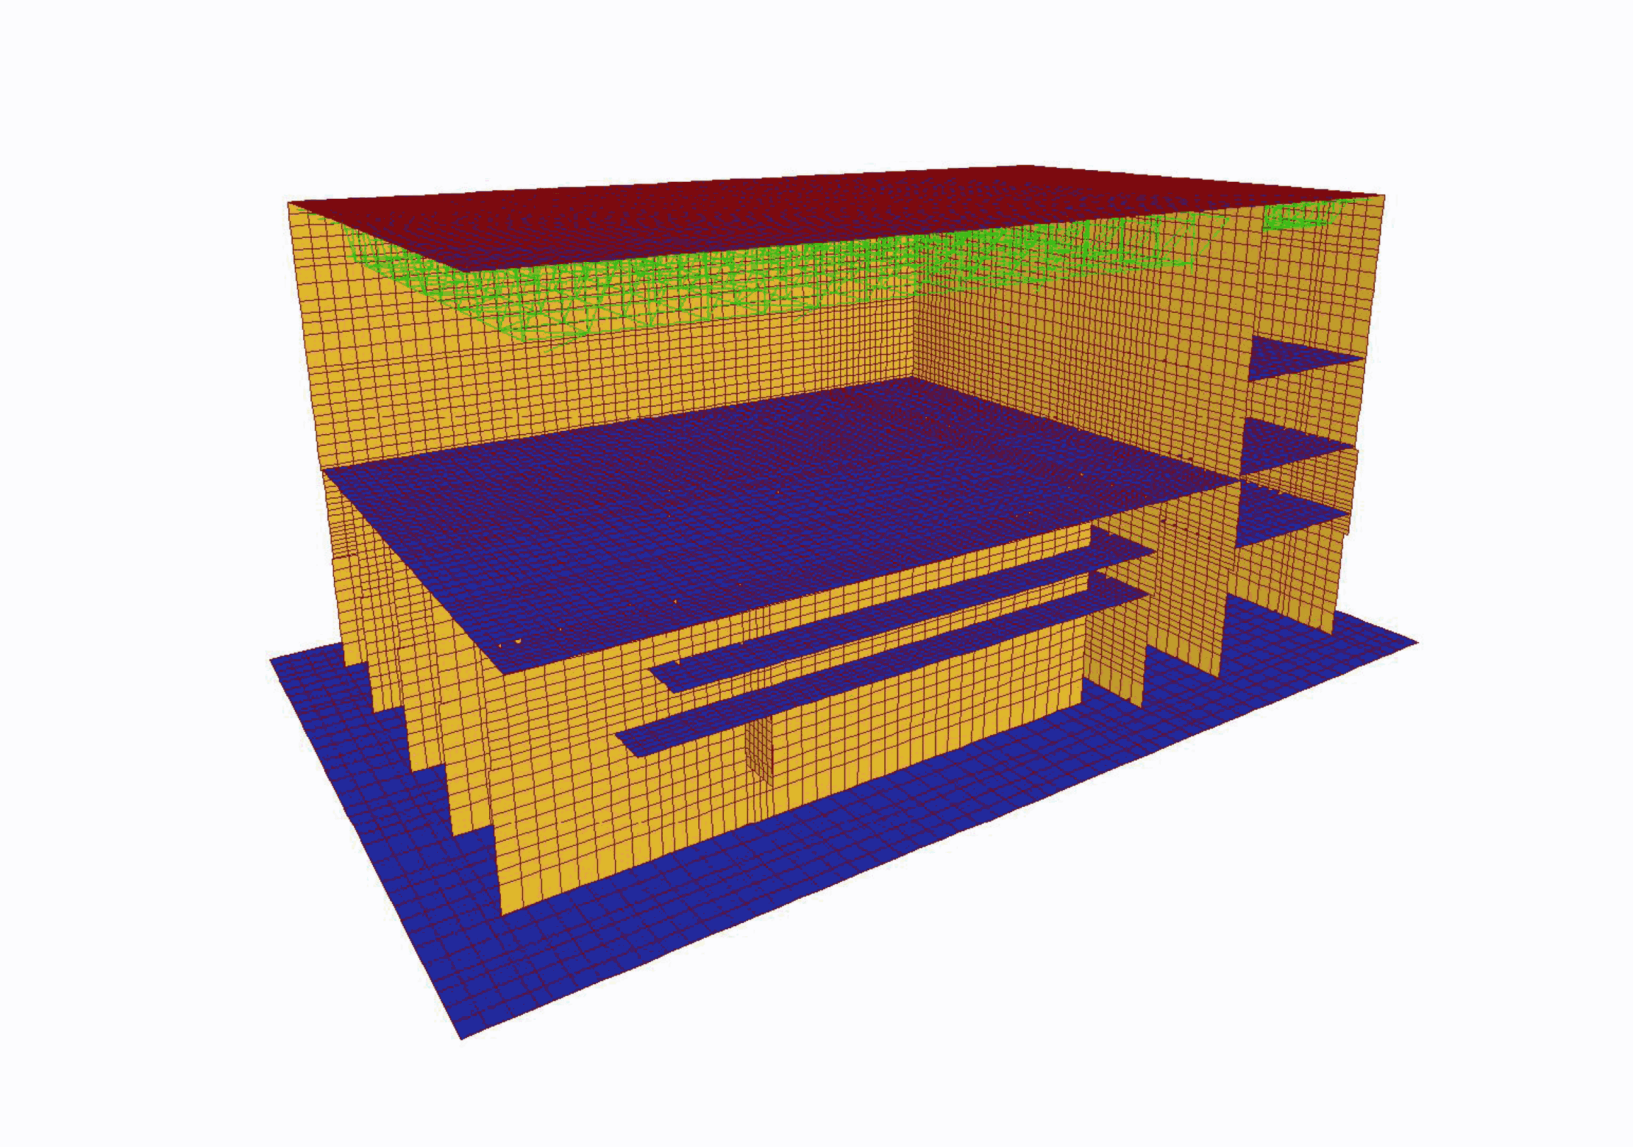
H.3-6 Radwaste Building SAP2000 Model (South and West Walls Removed)
